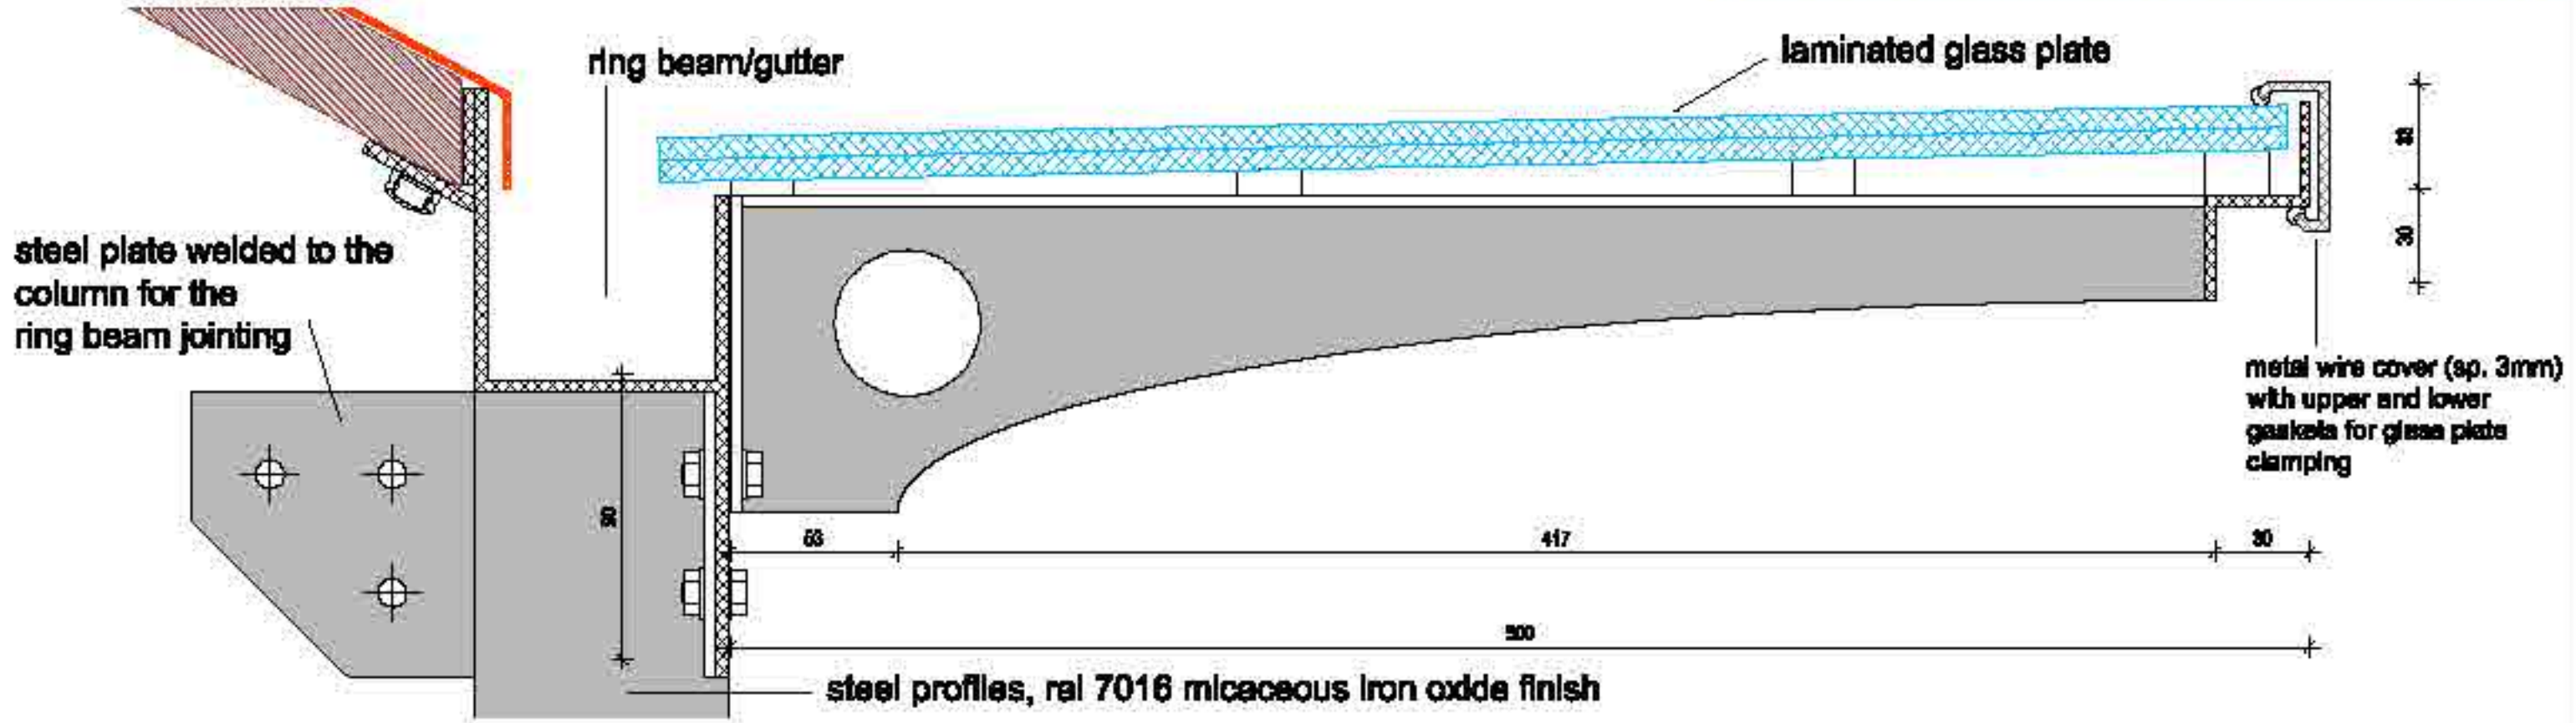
DETAIL OF THE END BOLTED CONNECTION TO THE RING BEAM - scale 1:5
